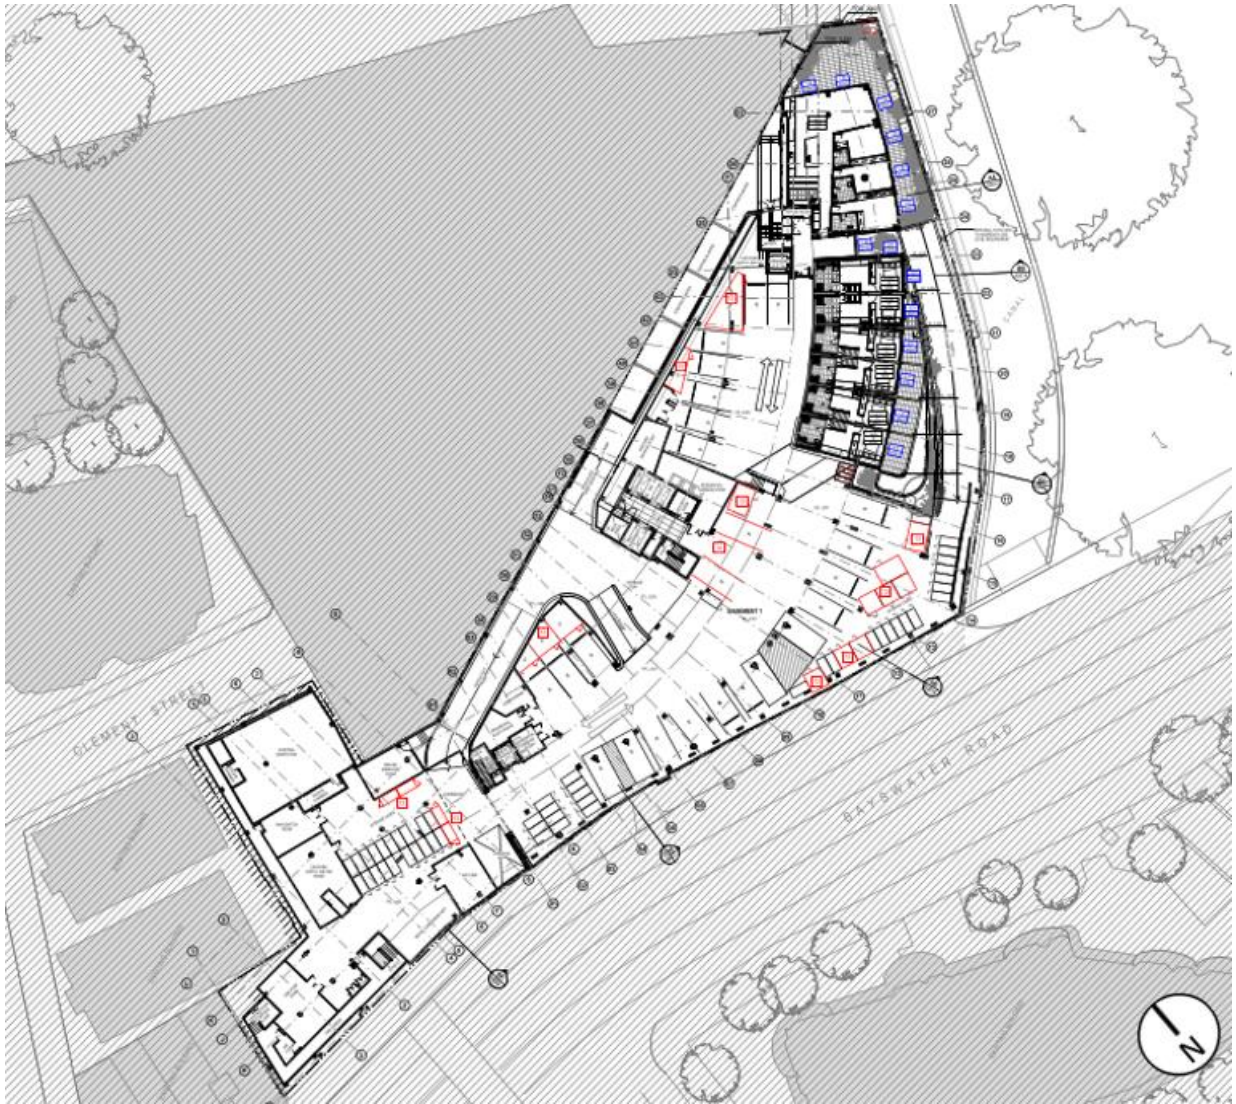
Proposed Basement 1 (proposed storage cages shown in red)
